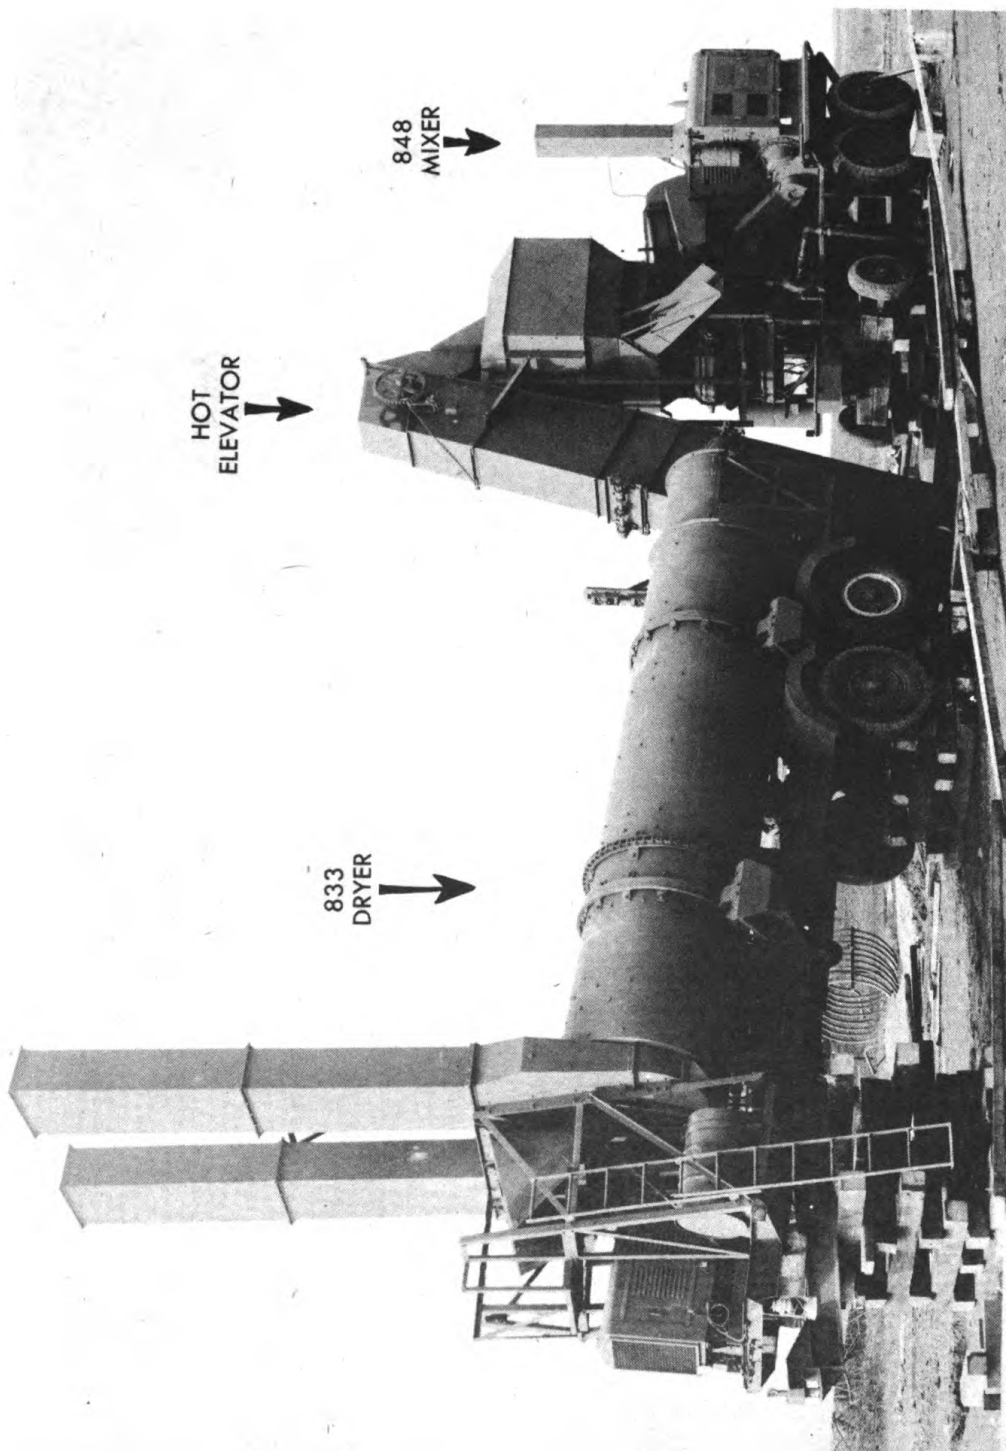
BARBER-GREENE MODEL 833 DRYER BEING SET UP WITH HOT ELEVATOR AND OTHER EQUIPMENT TO FORM CENTRAL PLANT.
